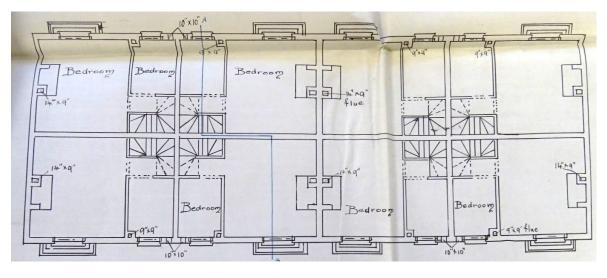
The first floor had two bedrooms (Carby Hall 1896a).
